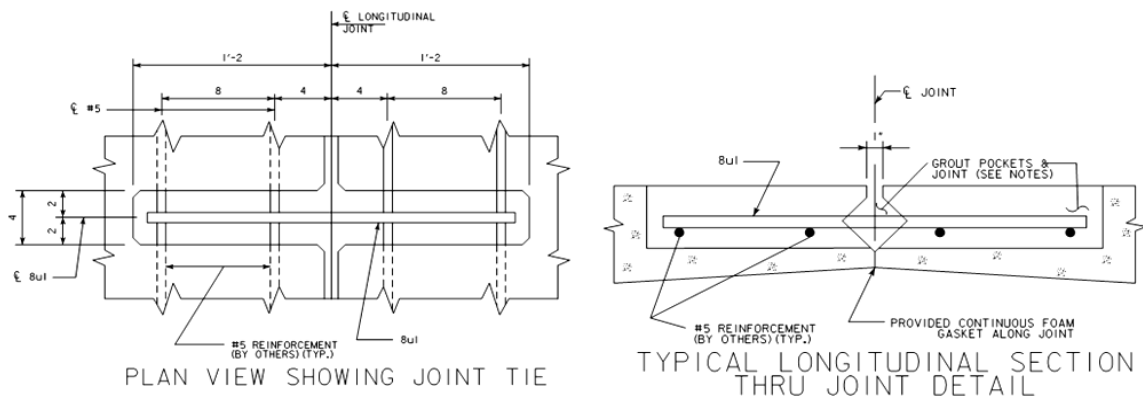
Pi-Girder Longitudinal Joint Connection Detail
